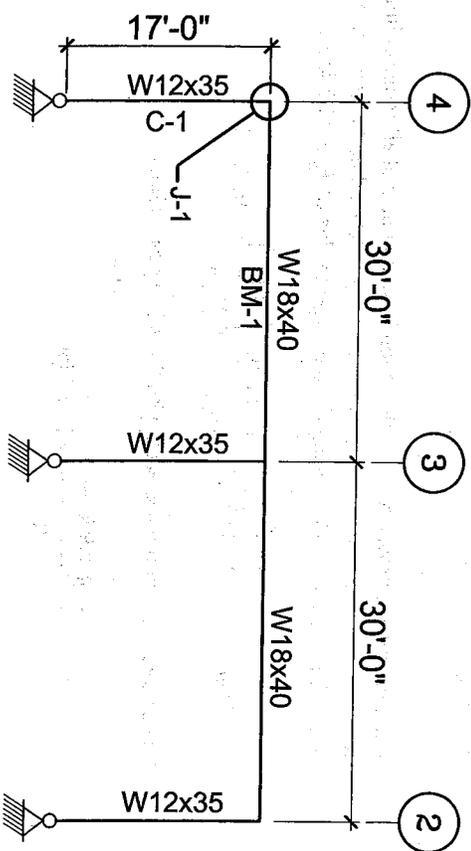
OMF elevation for Examples 4.1, 4.2, 4.3, and 4.4.
